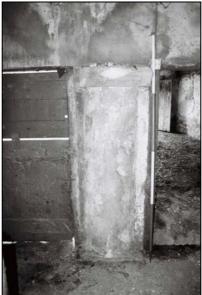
, 265: the shelter shed (BIg.8), detail of one of the protruding stone piers to the south wall, from the north
